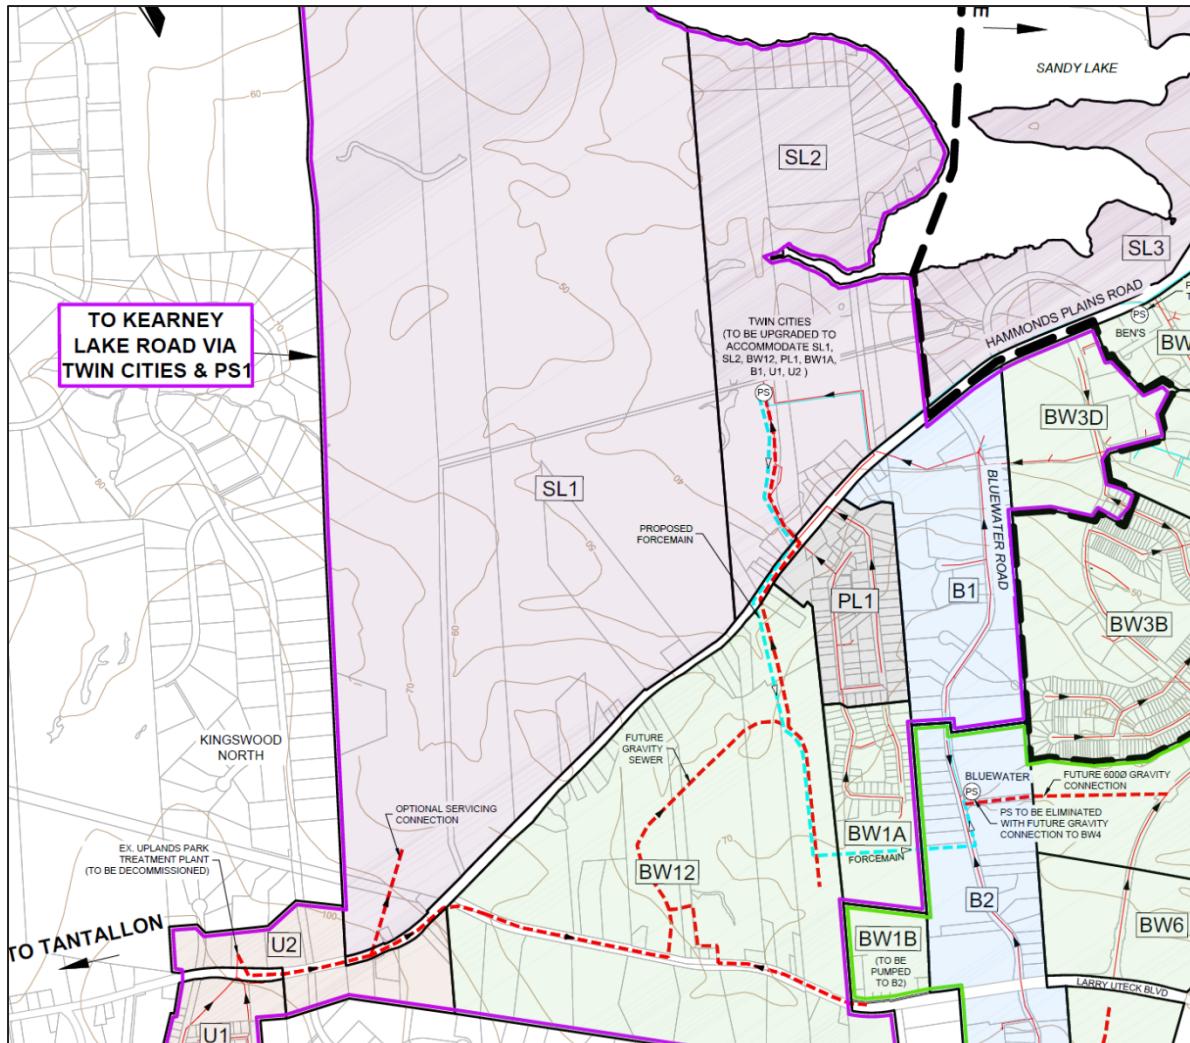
Wastewater Infrastructure Area Plan (DesignPoint, 2017)
